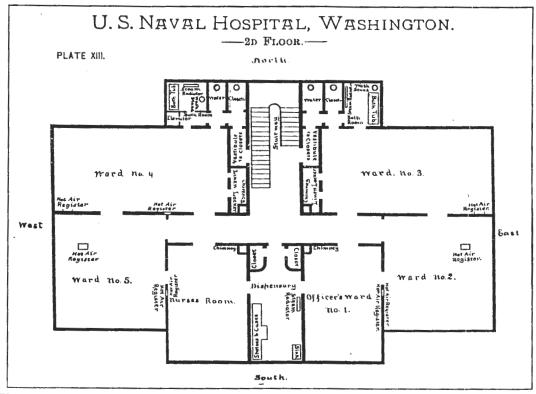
Washington Naval Hospital - Second Floor Plan, 1893. Gatewood,
